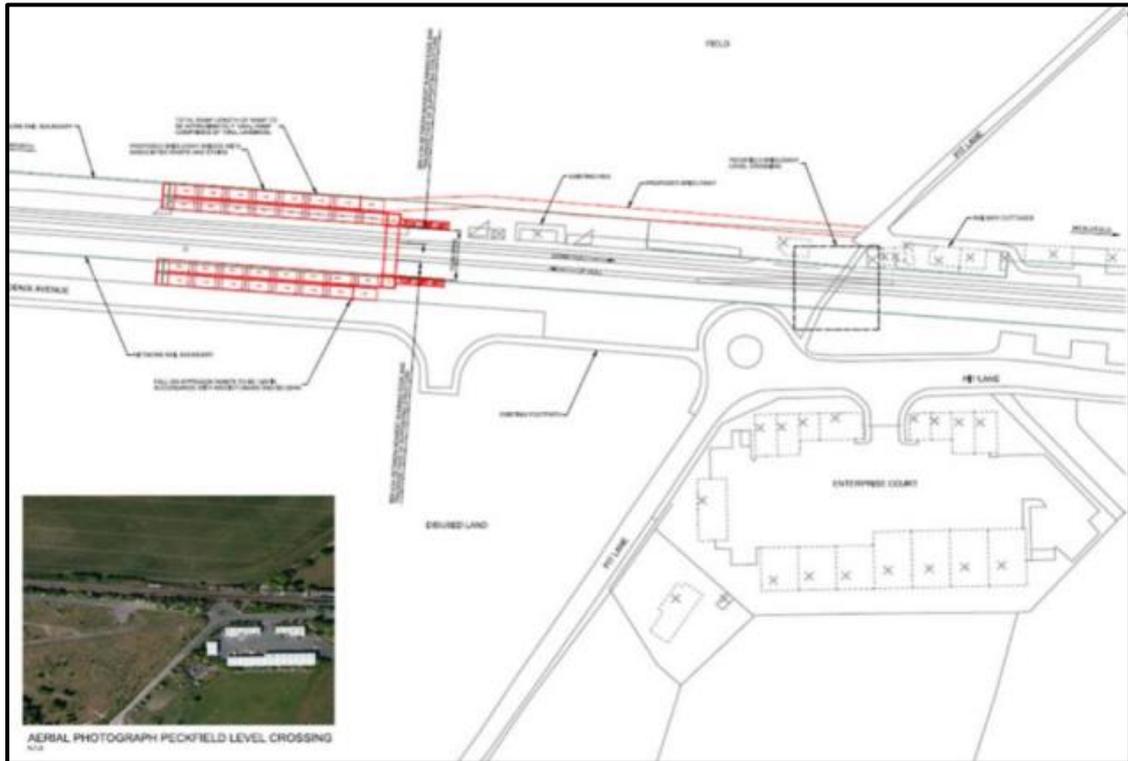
Option 4 – New ramped brideway bridge to west of existing buildings
